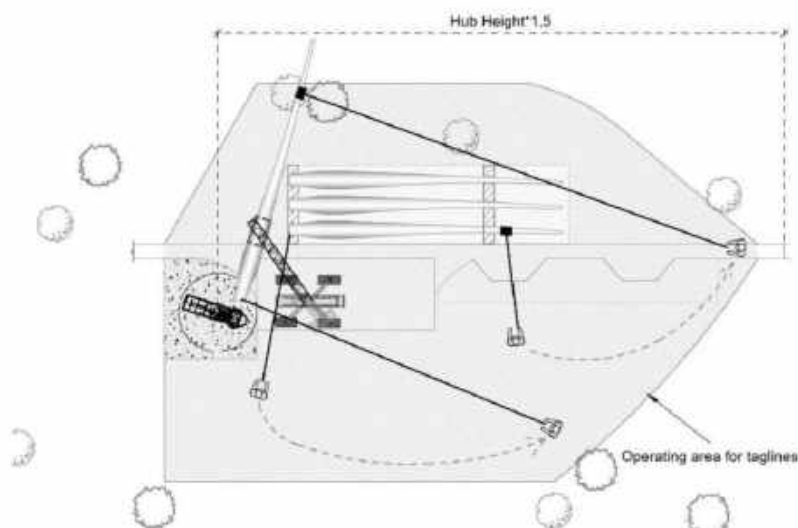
Indicative drawing of area requirements for the use of tag lines with single blade installation method
